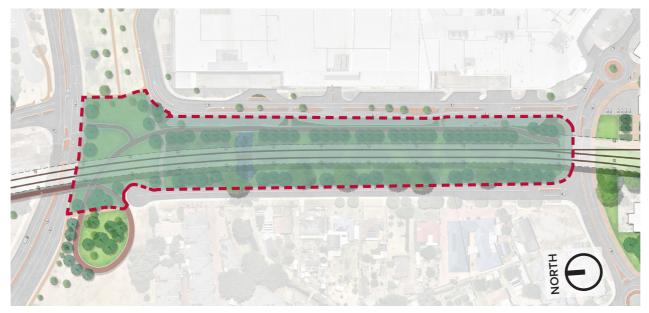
INVESTMENT LEVELS PLAN - NORTH OF FORREST ROAD
